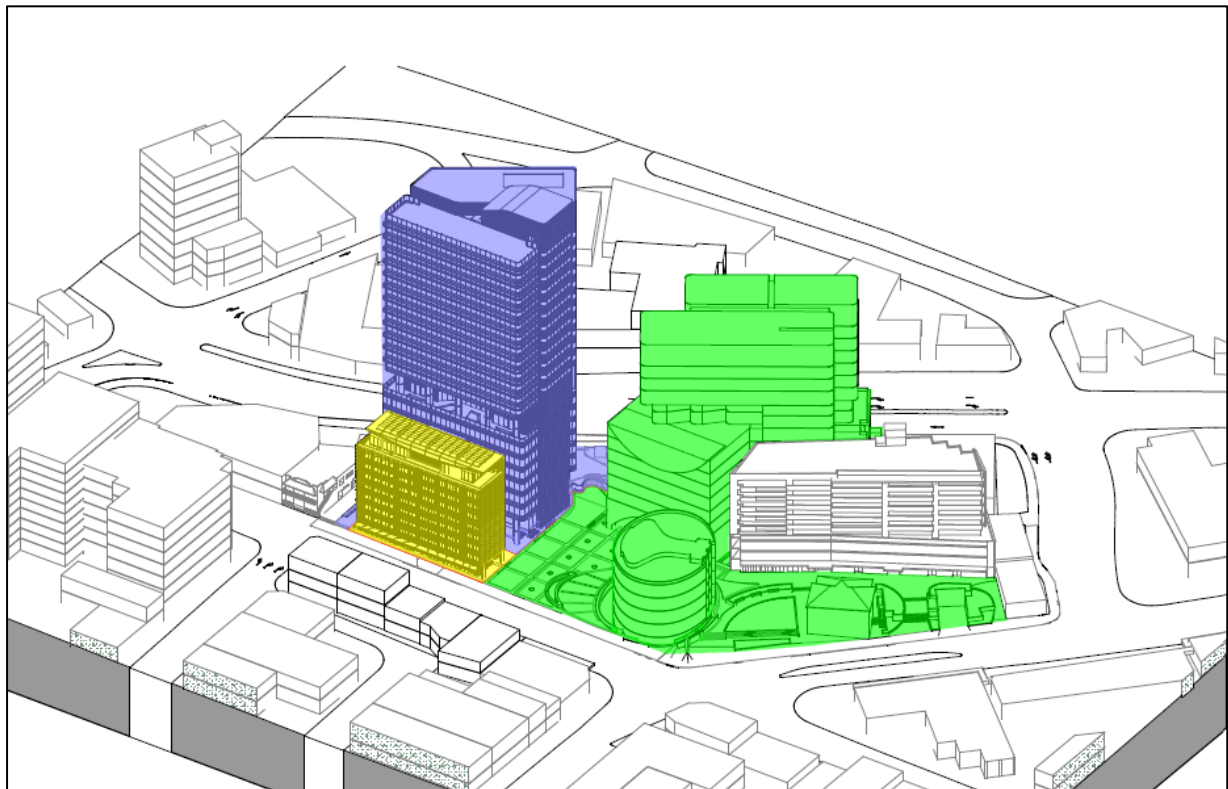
Proposed subdivision layout – 3D Isometric Model (Source: Built).
